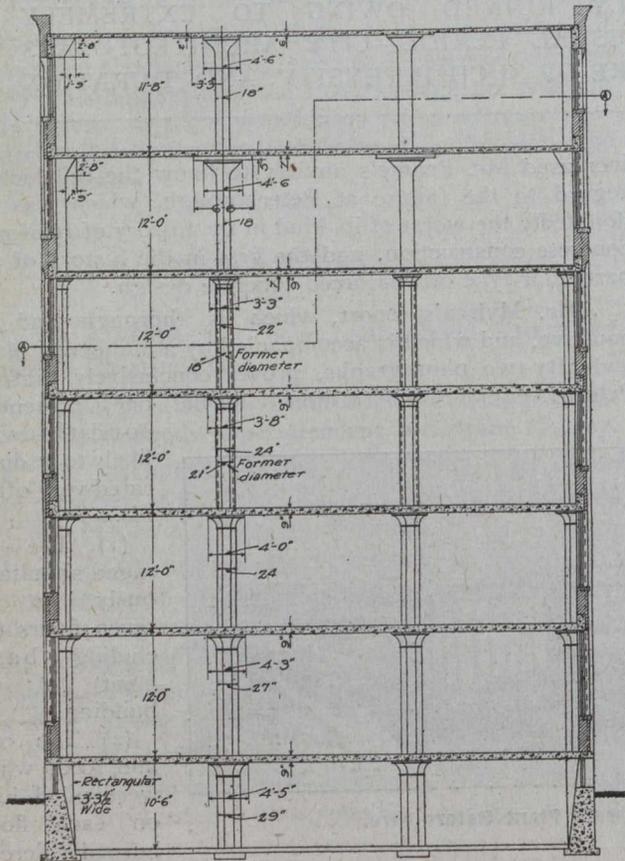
Typical Cross-Section of Concrete Warehouse.
